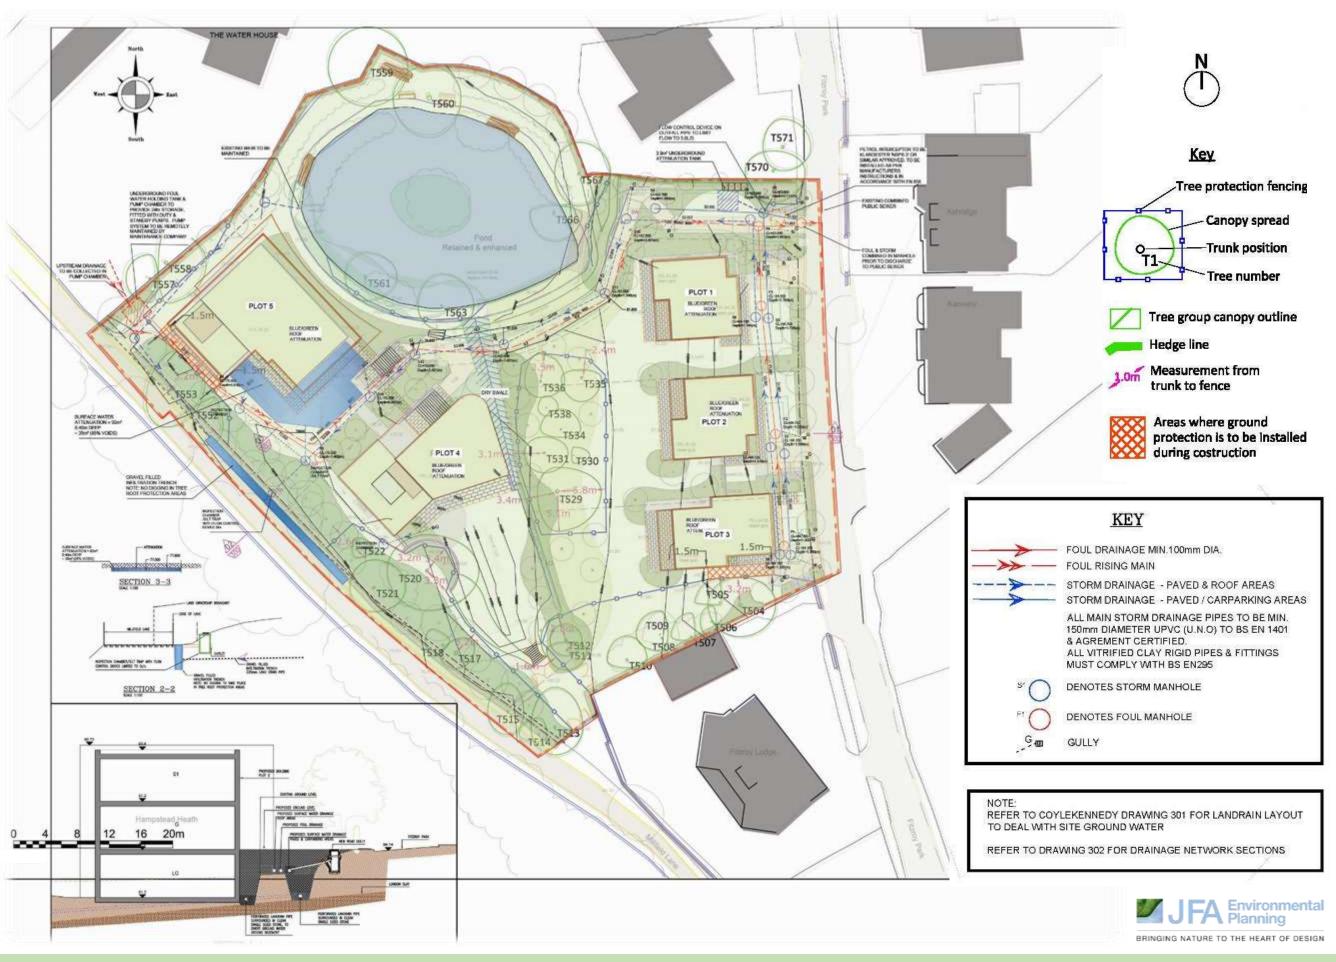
TREE REMOVAL PLAN OVERLAID ONTO DRAINAGE LAYOUT
